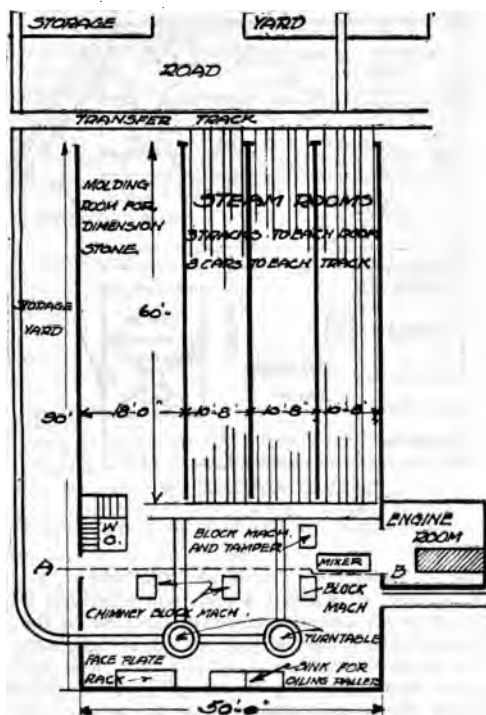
FIRST FLOOR PLAN, PLANT NO. 5
